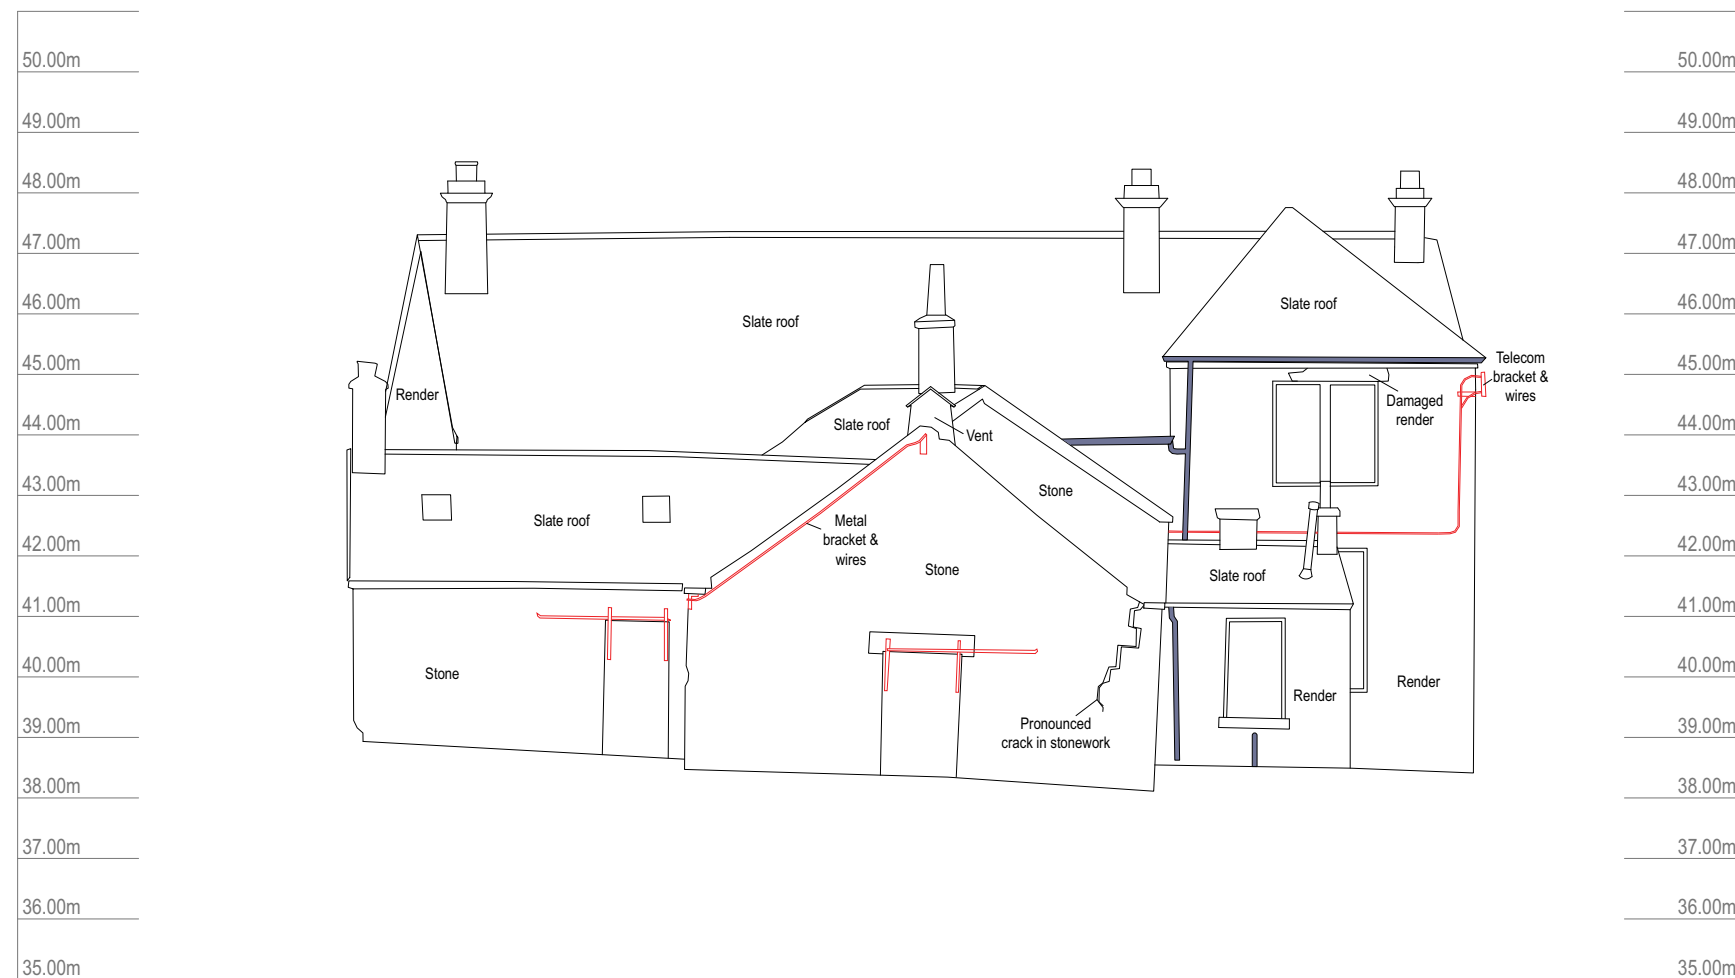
South facing elevation of the boiler house & farmhouse showing elevations 15, 13, 11, 28 & 26.
